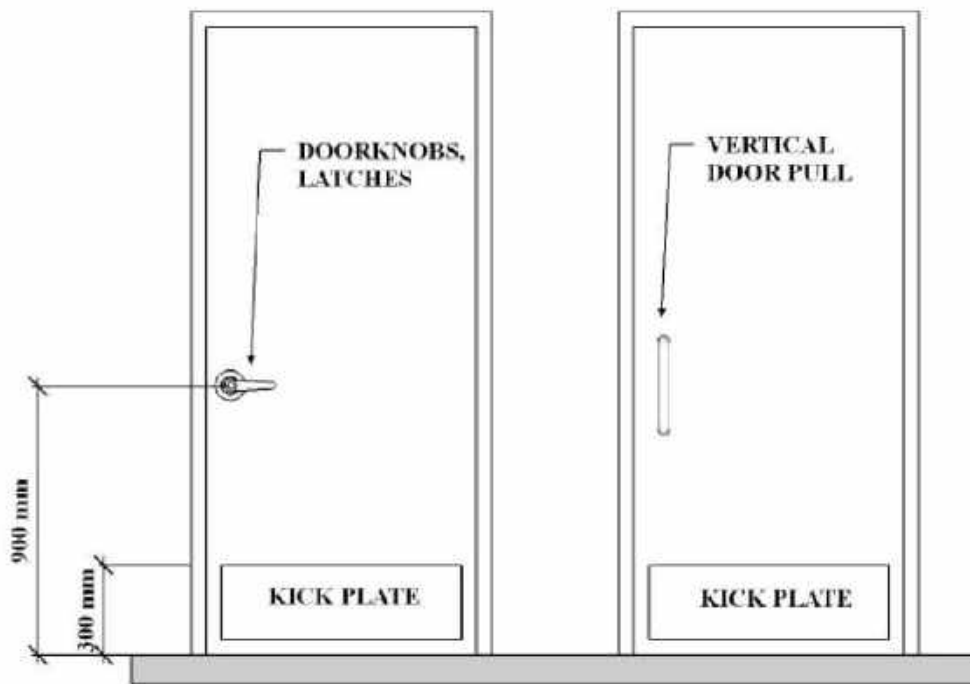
The left image shows a door that uses a lever type lockset. The right shows a door with a vertical door pull. Both doors are provided with kick plates
